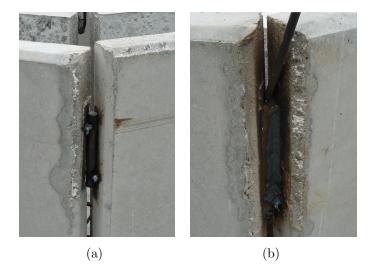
Double wall connection by (a) weld base embedments with filling bars in-between (b) welded to the adjacent bases
